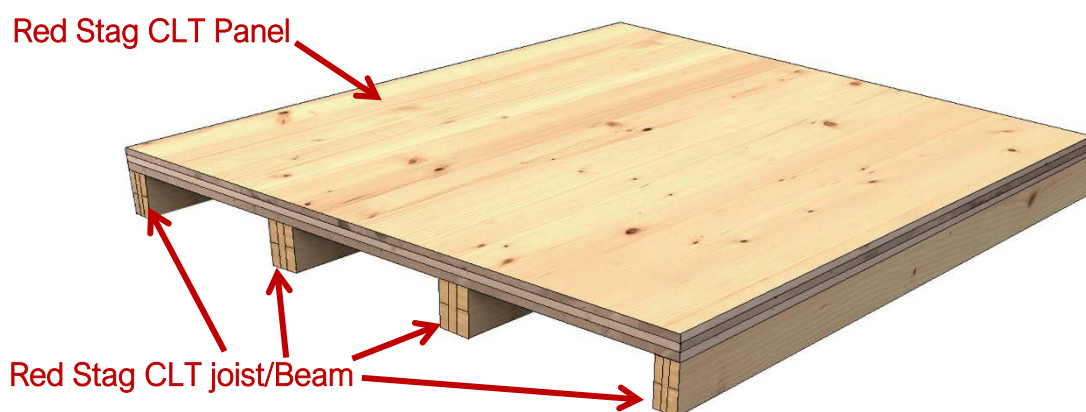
Example of a Red Stag CLT beam and CLT floor system.
